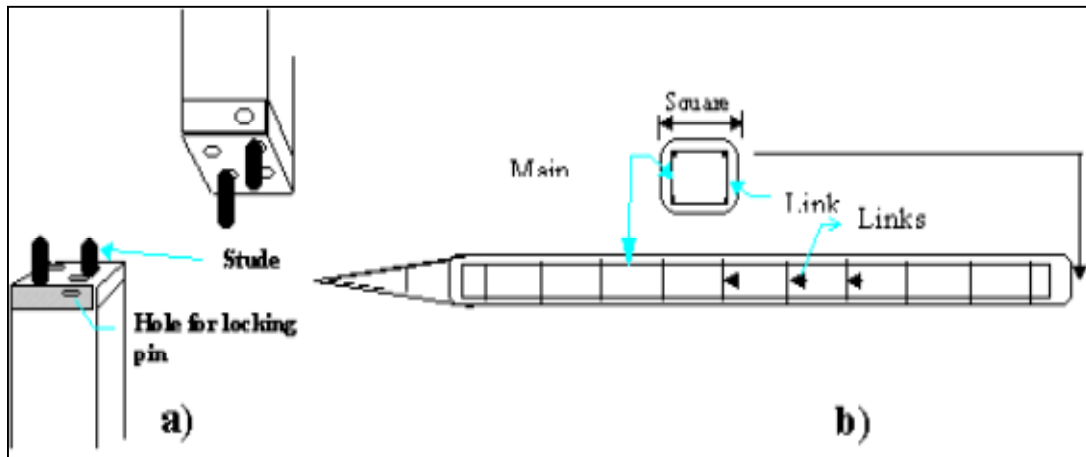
1 a) Concrete pile connecting detail. b) Squared pre-cast concert pile. (36)
